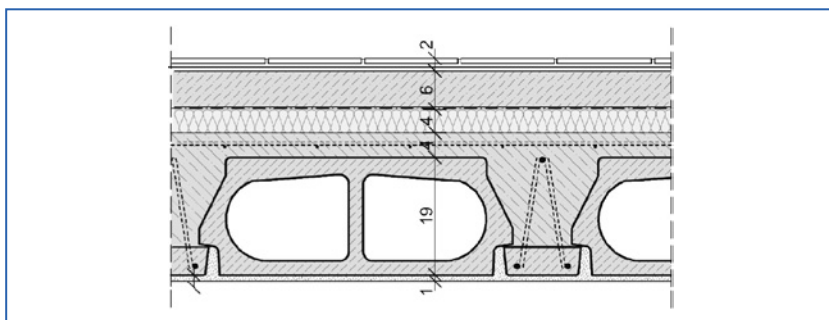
Cross-section of the most typical heavyweight floor construction, the layers from top to bottom: floor tiling, screed, foil, impact sound insulation layer, beam-and-hollow-block floor system with concrete upper layer, parge coat. [[2] - (Hungary)].
